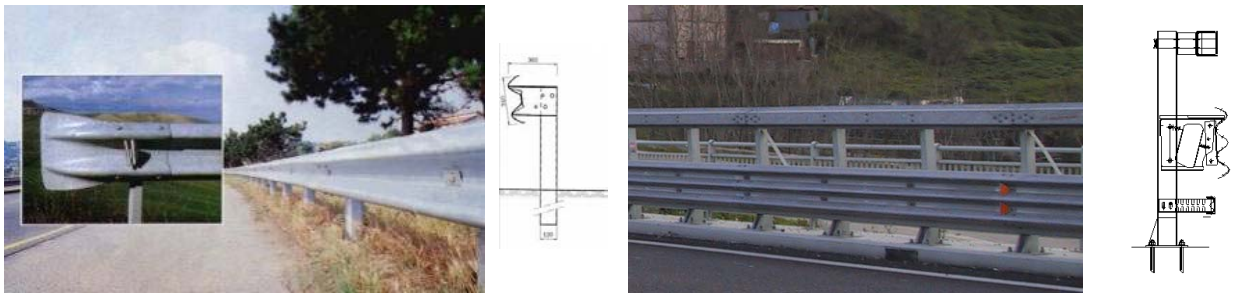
Two samples showing the evolution of steel barriers in the last 20 years: the common two beam profile used since the 70s (left) and one of the heavy containment bridge guardrails (right)
